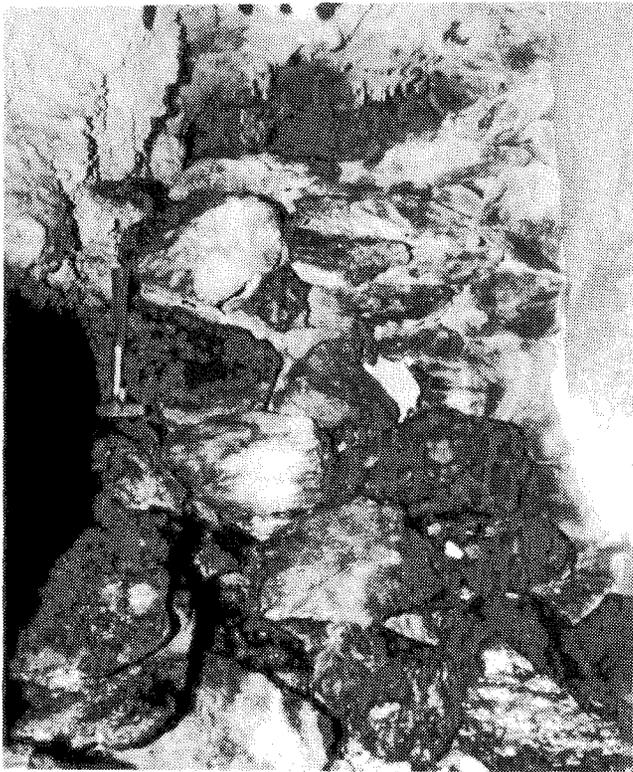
Upstream wall constructed in the cave system beneath the railbed (Photo: A. McConnell)
